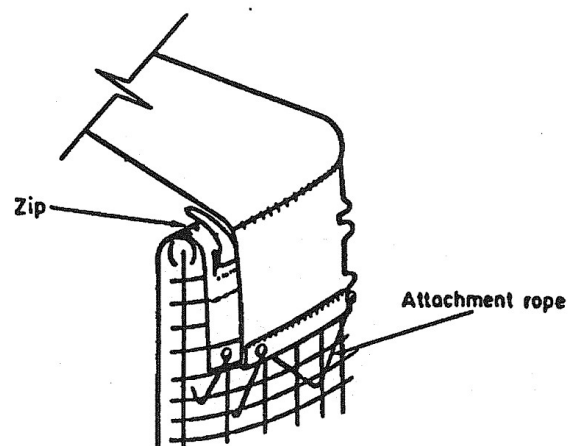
Method of securing roof-cone to floor-wall unit and weld-mesh walls in silos.
